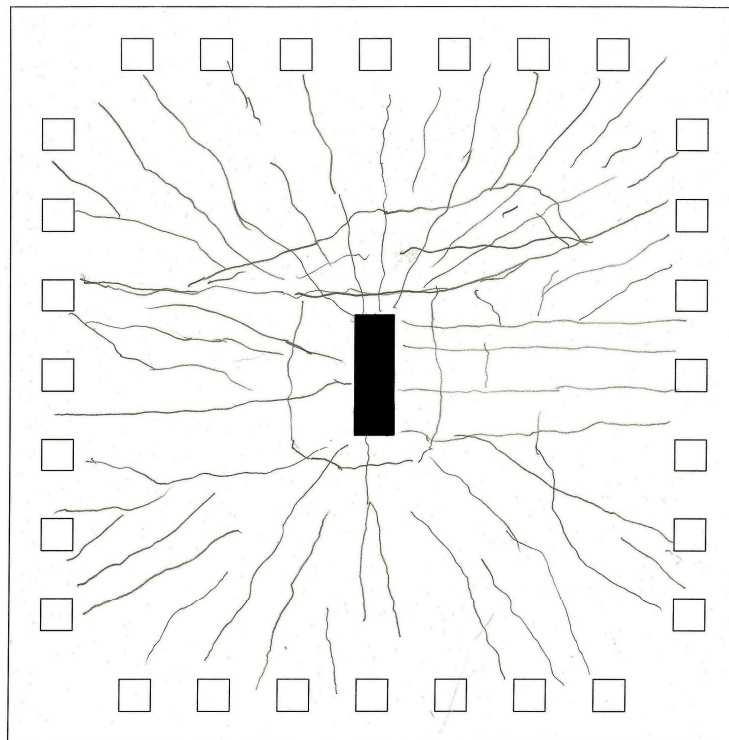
Failure surfaces and crack patterns of specimen R2
